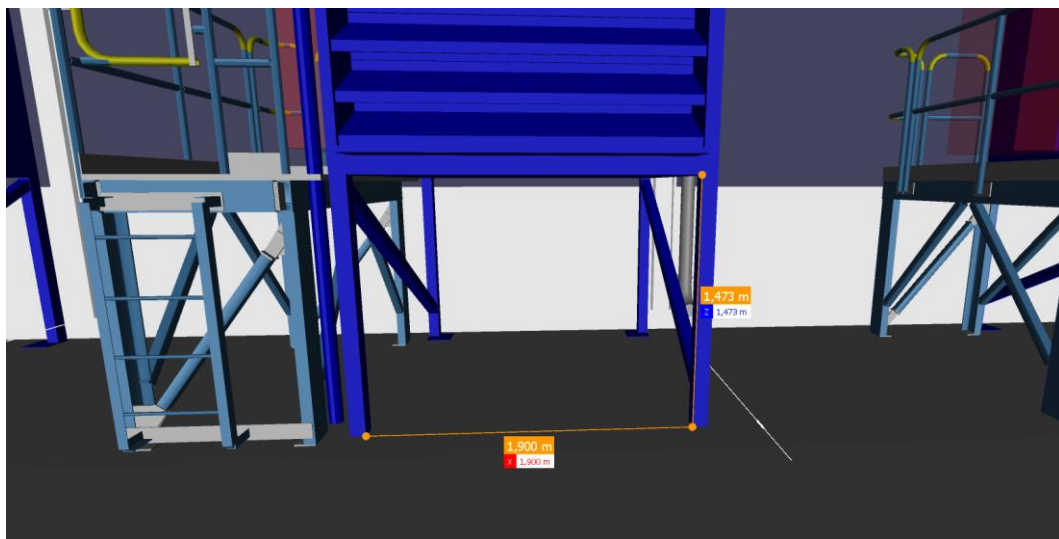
Dimensions under a HVAC unit outside the engine hall.
